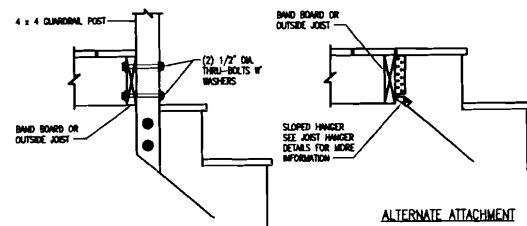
STAIR STRINGER CONNECTION DETAIL
